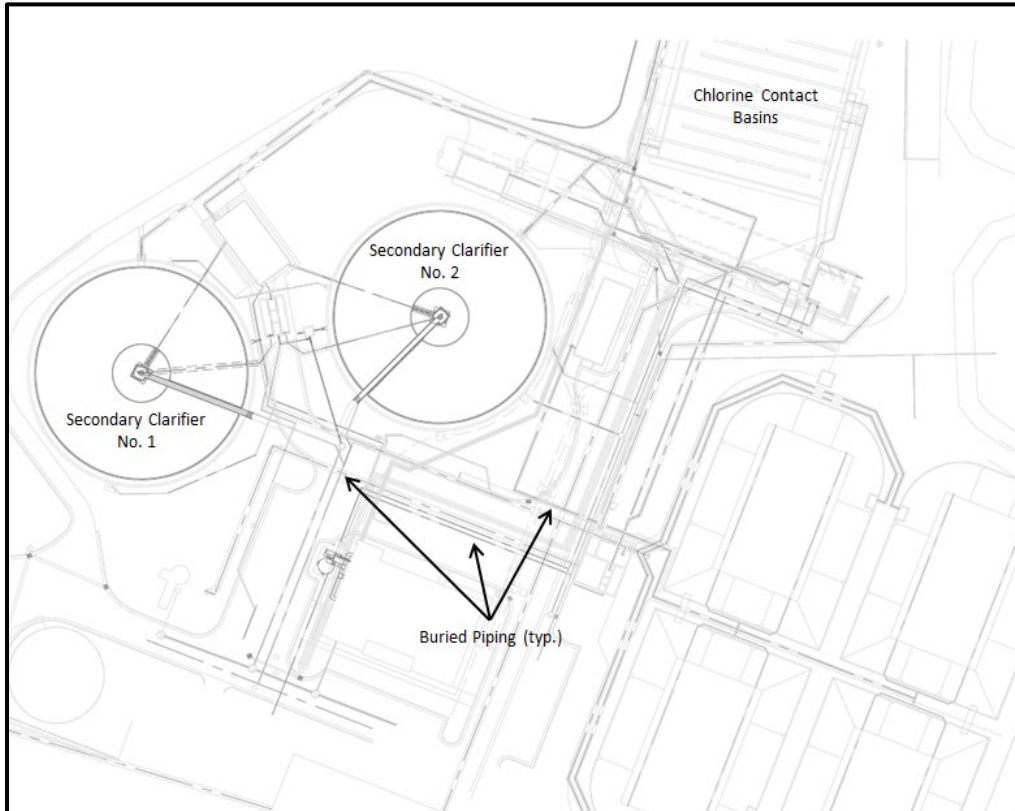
Partial Site Plan Showing Buried Piping - (Source: Sonoma Water CAD/GIS Application Gallery – September 2016)
